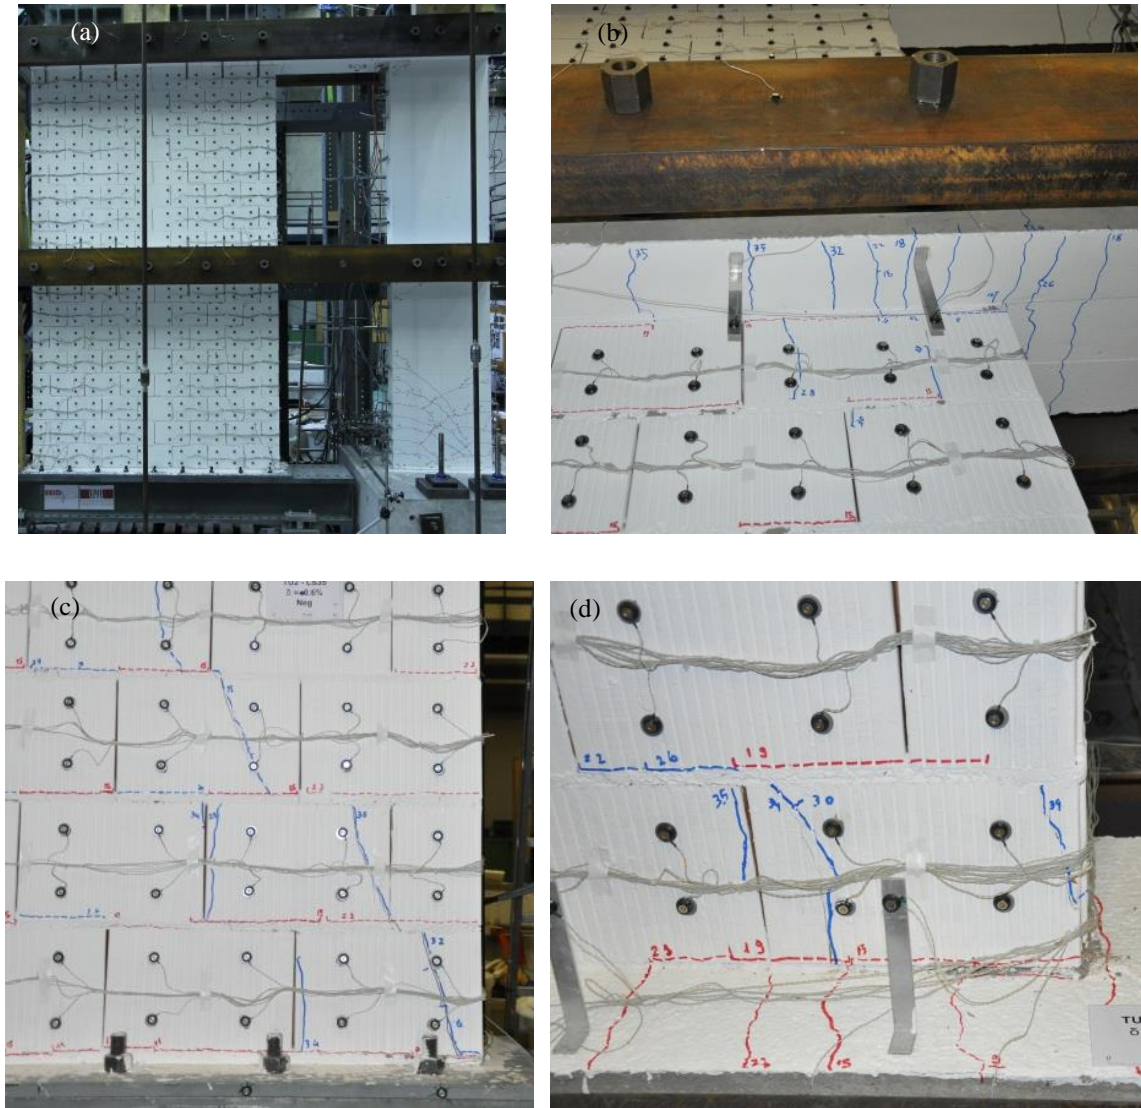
Crack pattern at LS35, $\delta = +0.6\%$. (a): specimen; (b) RC first storey beam, curvature penetration into the URM wall; (c, d): compressed corner of the first and second storey of the URM wall.
